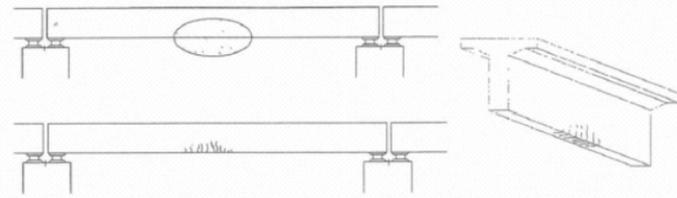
Flexural cracks of concrete girder
